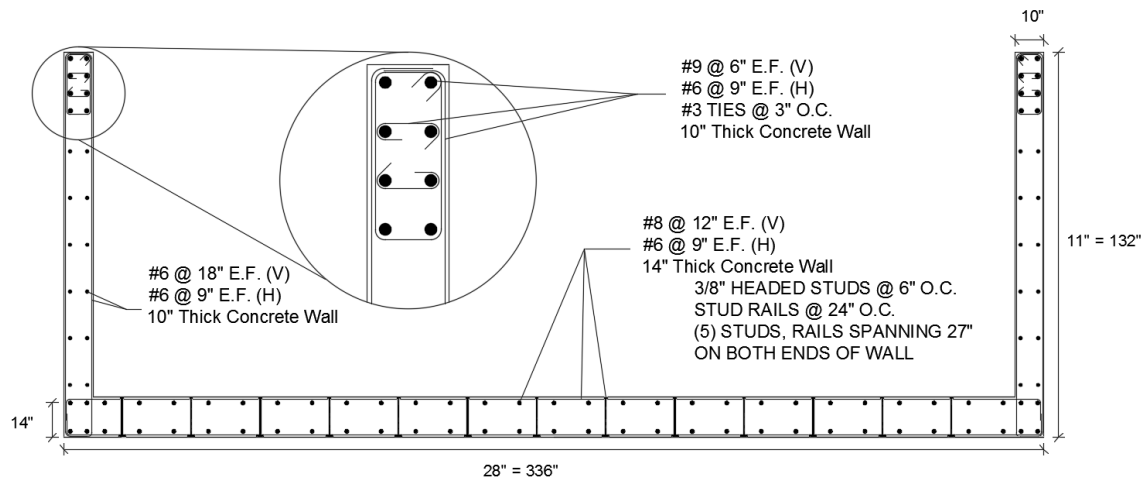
New overall 3rd floor Elevator/ Mech. Room shear wall
